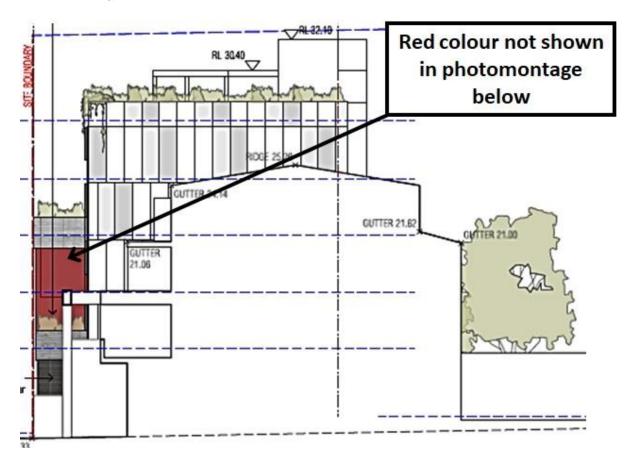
South-west elevation showing application of 'Lady In Red' to facade.
